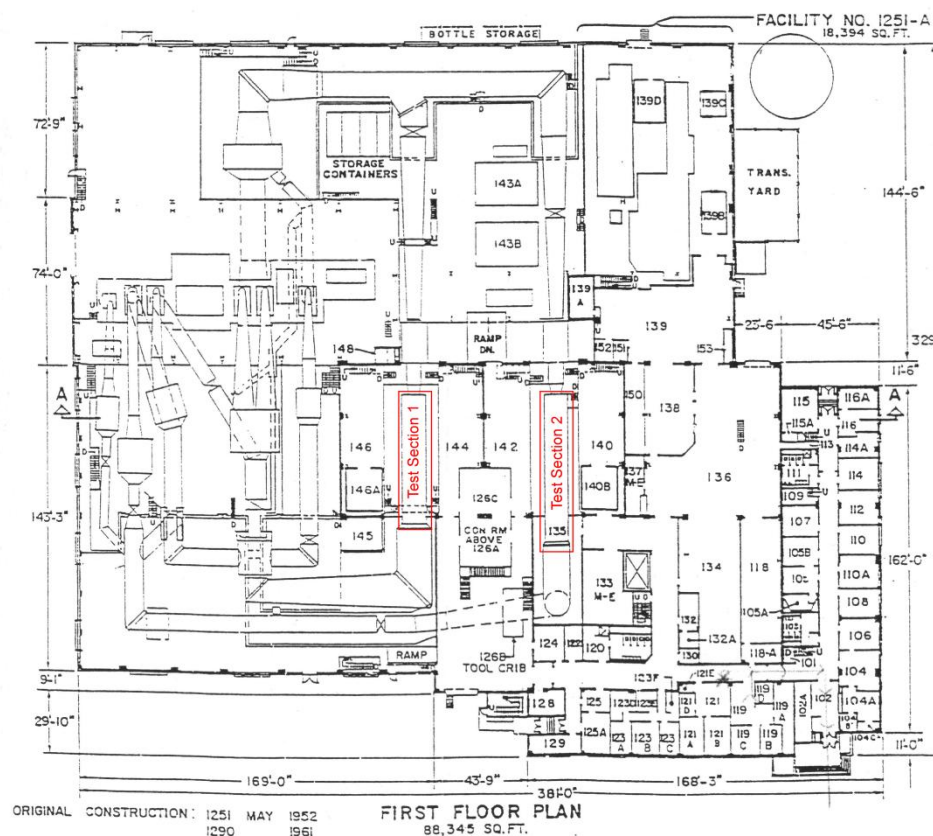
Langley Unitary Plan Wind Tunnel physical layout
